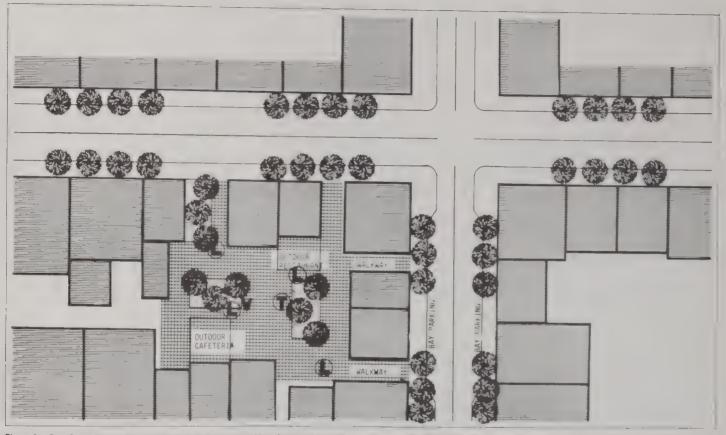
Plan 2, low budget improvements to an intersecting Main Street. An interior placed courtyard with four main pedestrian access points and softened with planted trees and shrubbery.
